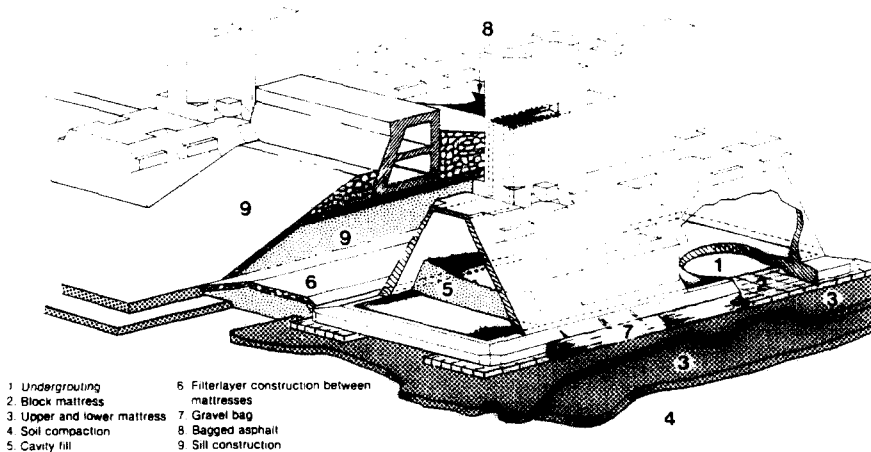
Oosterschelde storm surge barrier: sill and pier construction.⁶
